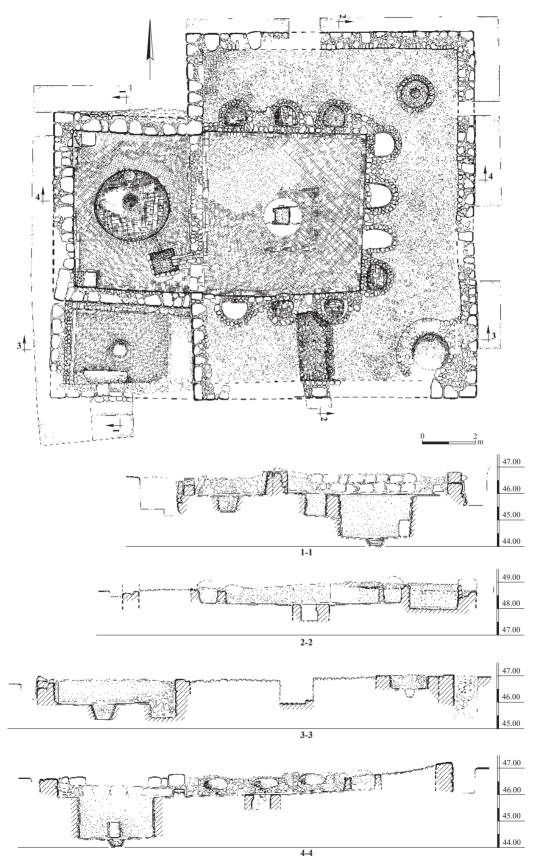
The winepress at Kefar Sirqin, plan and sections (see Sidi, Amit and Ad 2003: Plan 1).
